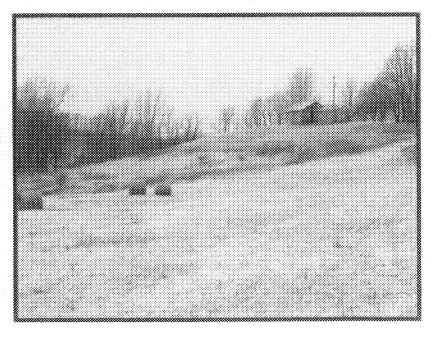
View of the haul road corridor facing northwest from approximately station 8+50.
